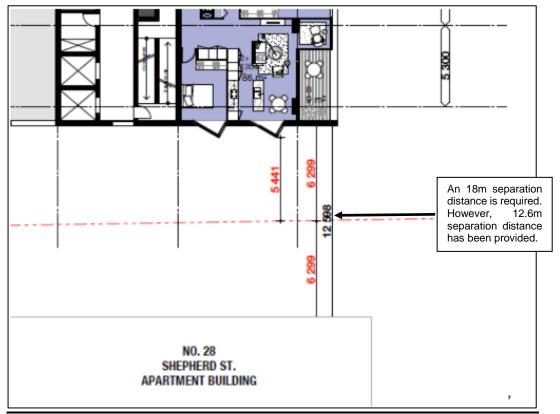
Building separation distance between 26 Shepherd Street and 28 Shepherd Street
